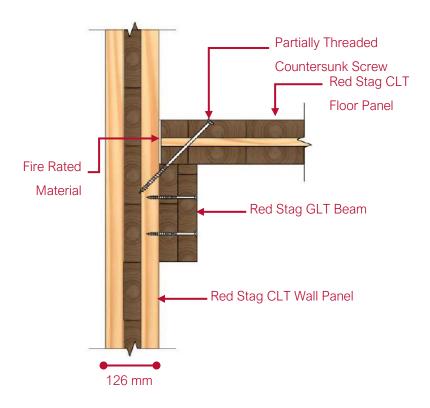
Red Stag CLT wall panel to CLT floor panel (On edge of external walls of building).
